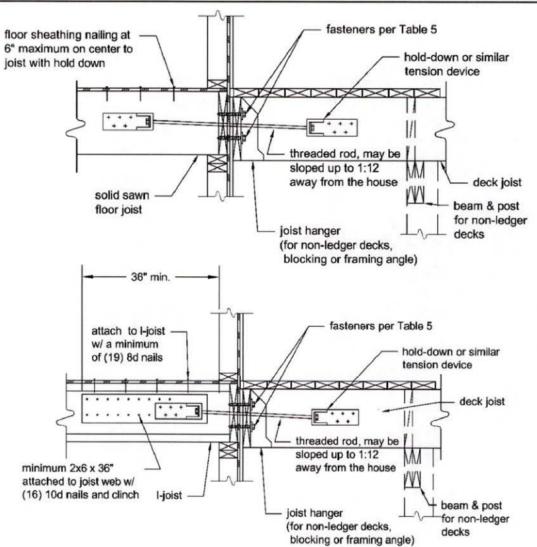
Lateral Load Device with Floor Joists Parallel to Deck Joists.
